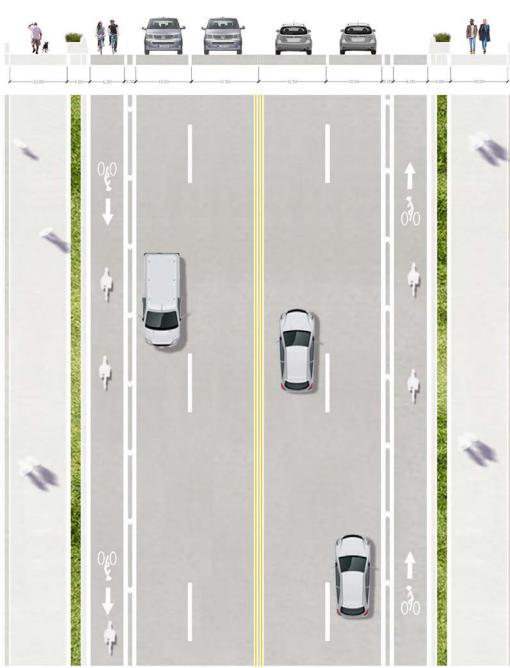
Existing Typical Section - Segment 2 - Connector Crossing
